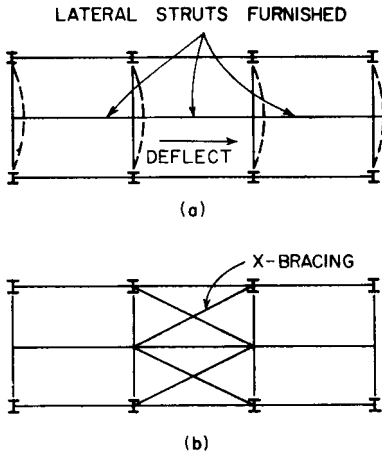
Lateral bracing systems; (a) without and (b) with X bracing.
